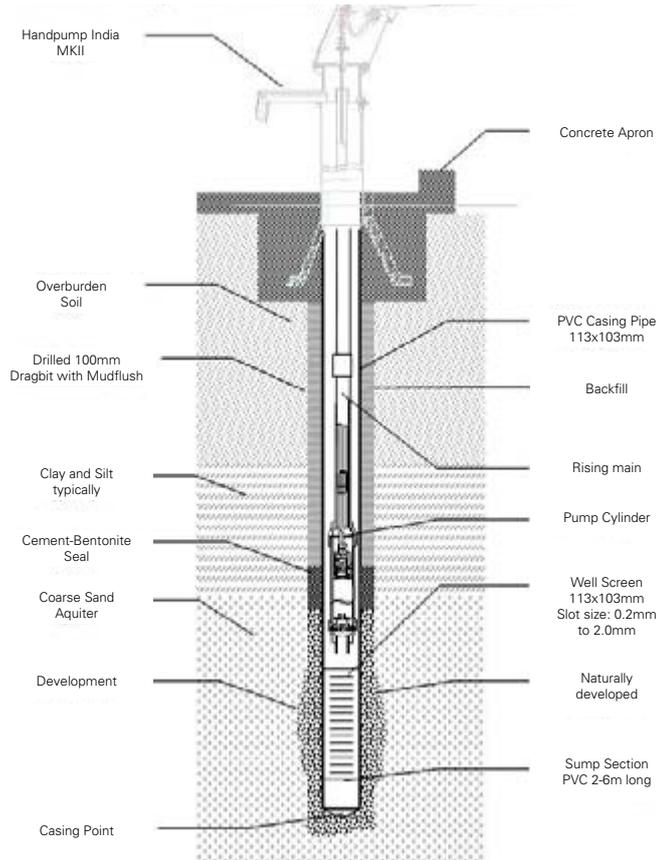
Typical design drawing of borehole in unconsolidated formation with casing
